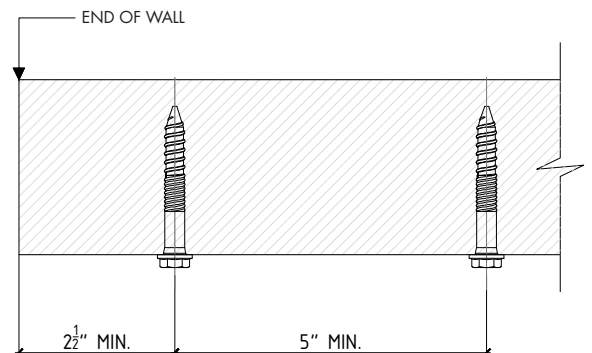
LOCATION, SPACING AND NO. OF FIXING POINTS OF HORIZONTAL PROFILES
